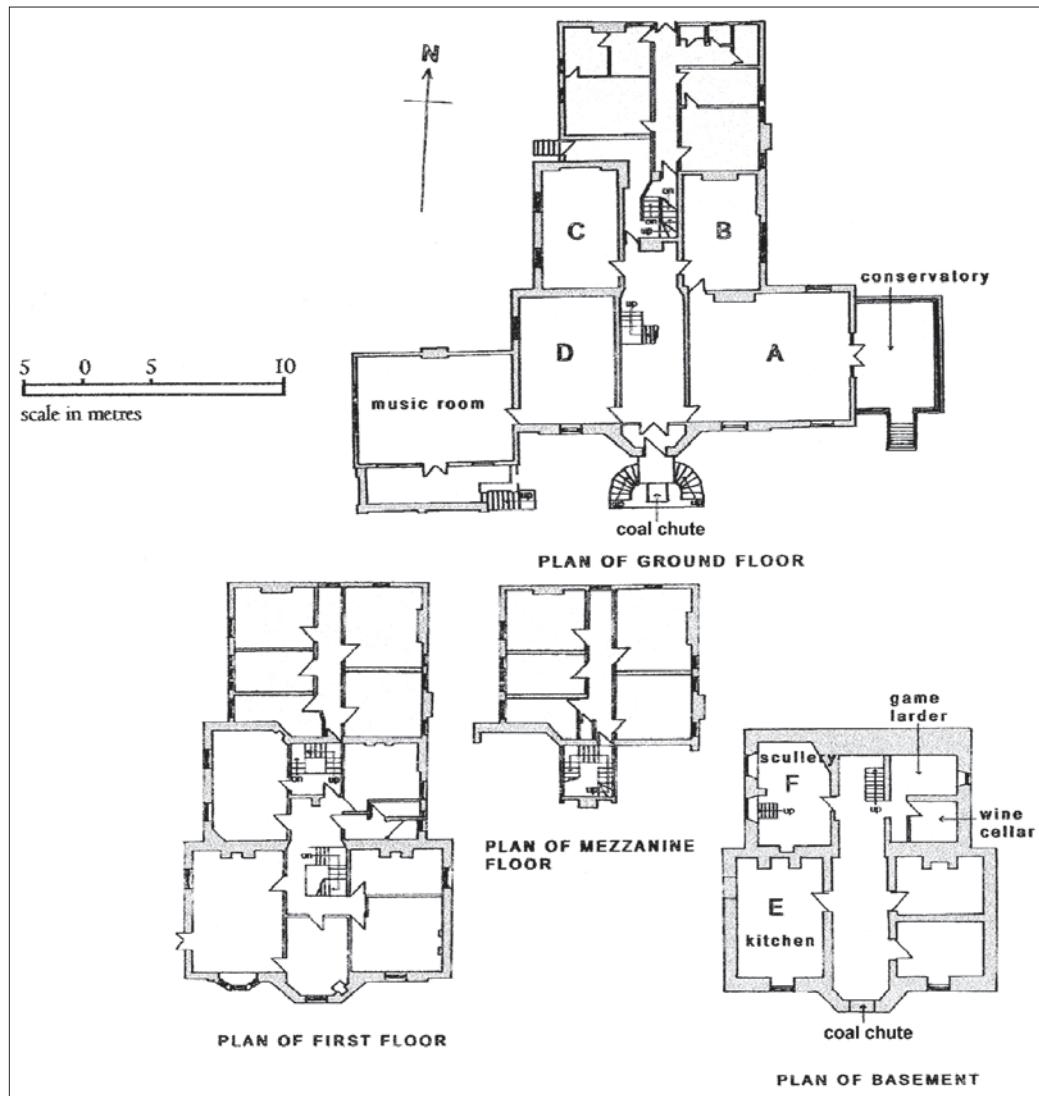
Floor plans of Bury Knowle House. (*Drawn by author.*)
